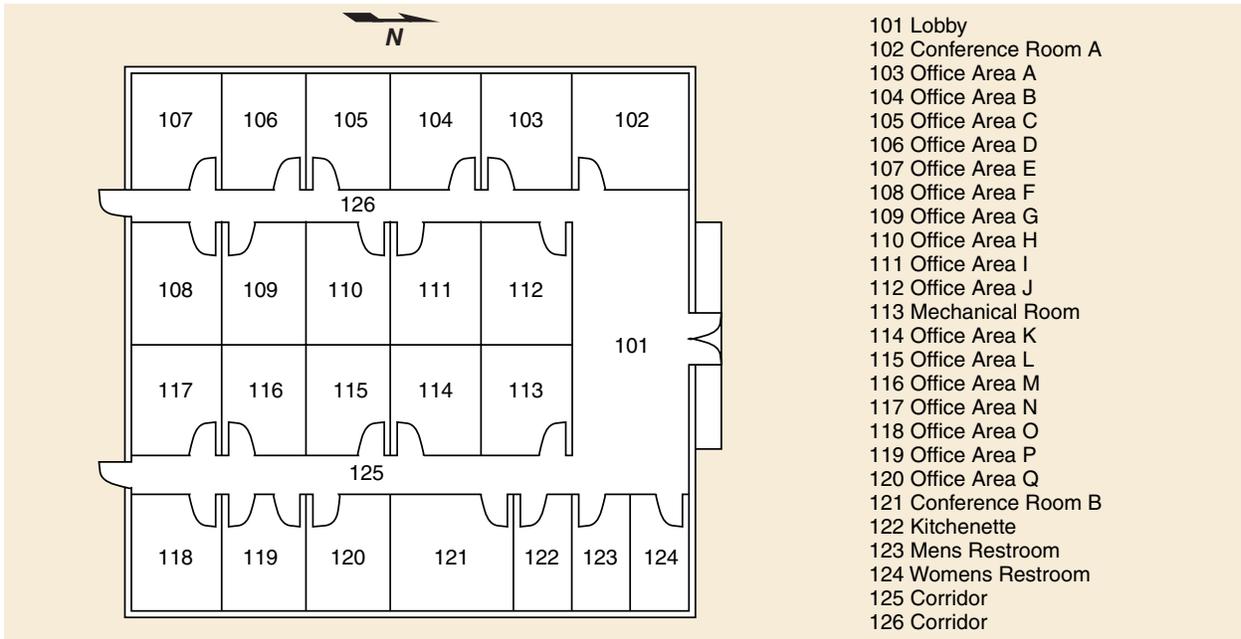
Building 5 Detailed Floor Plan, Astrotech
